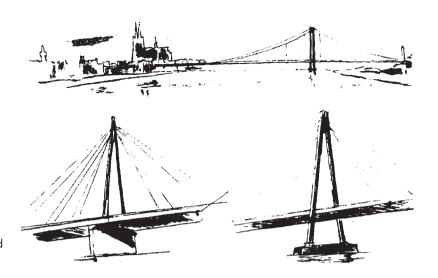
The architect's and engineer's sketches for a new bridge based on protecting the vista
